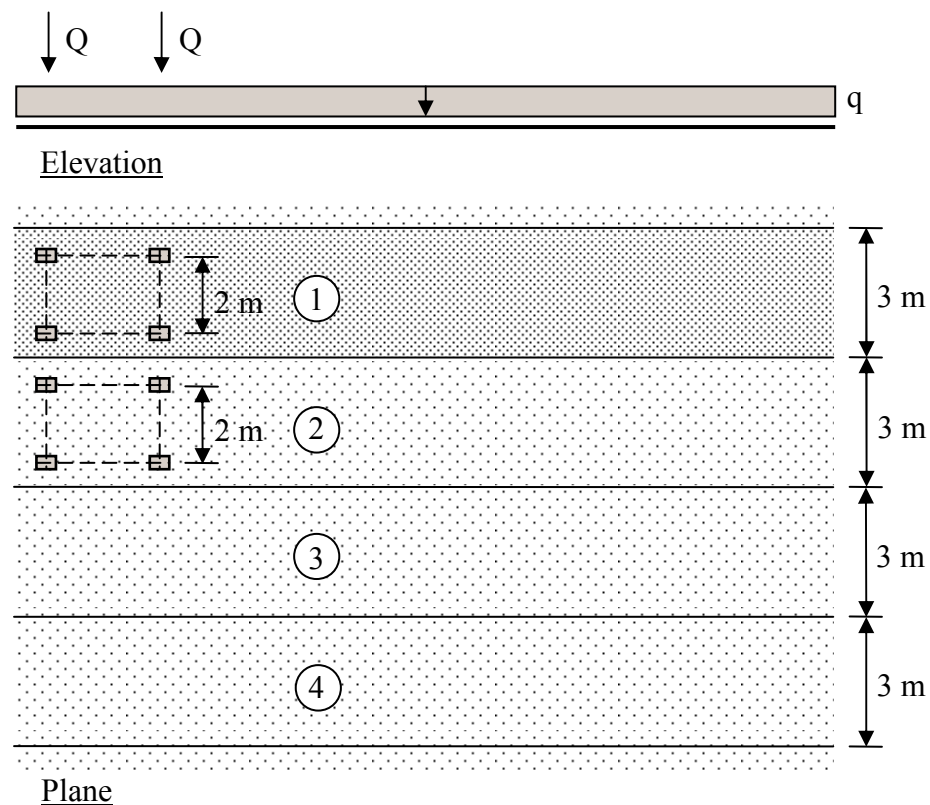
Schematic illustration of the application of Load Model 1 on a bridge with traffic lane width $w_l = 3\text{ m}$. Adopted from SS-EN 1991-2 (2003).
